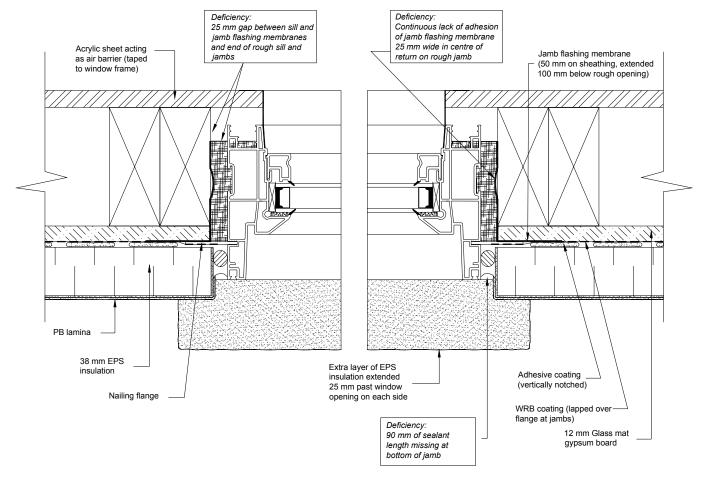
Wall/window interface for specimens No. 8 - horizontal section
